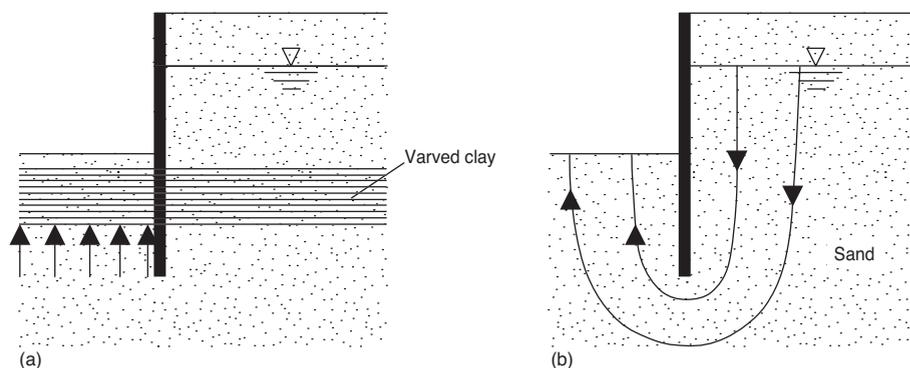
Examples of hydraulic failure mechanisms due to different soil conditions: (a) failure by uplift and (b) failure by heave
